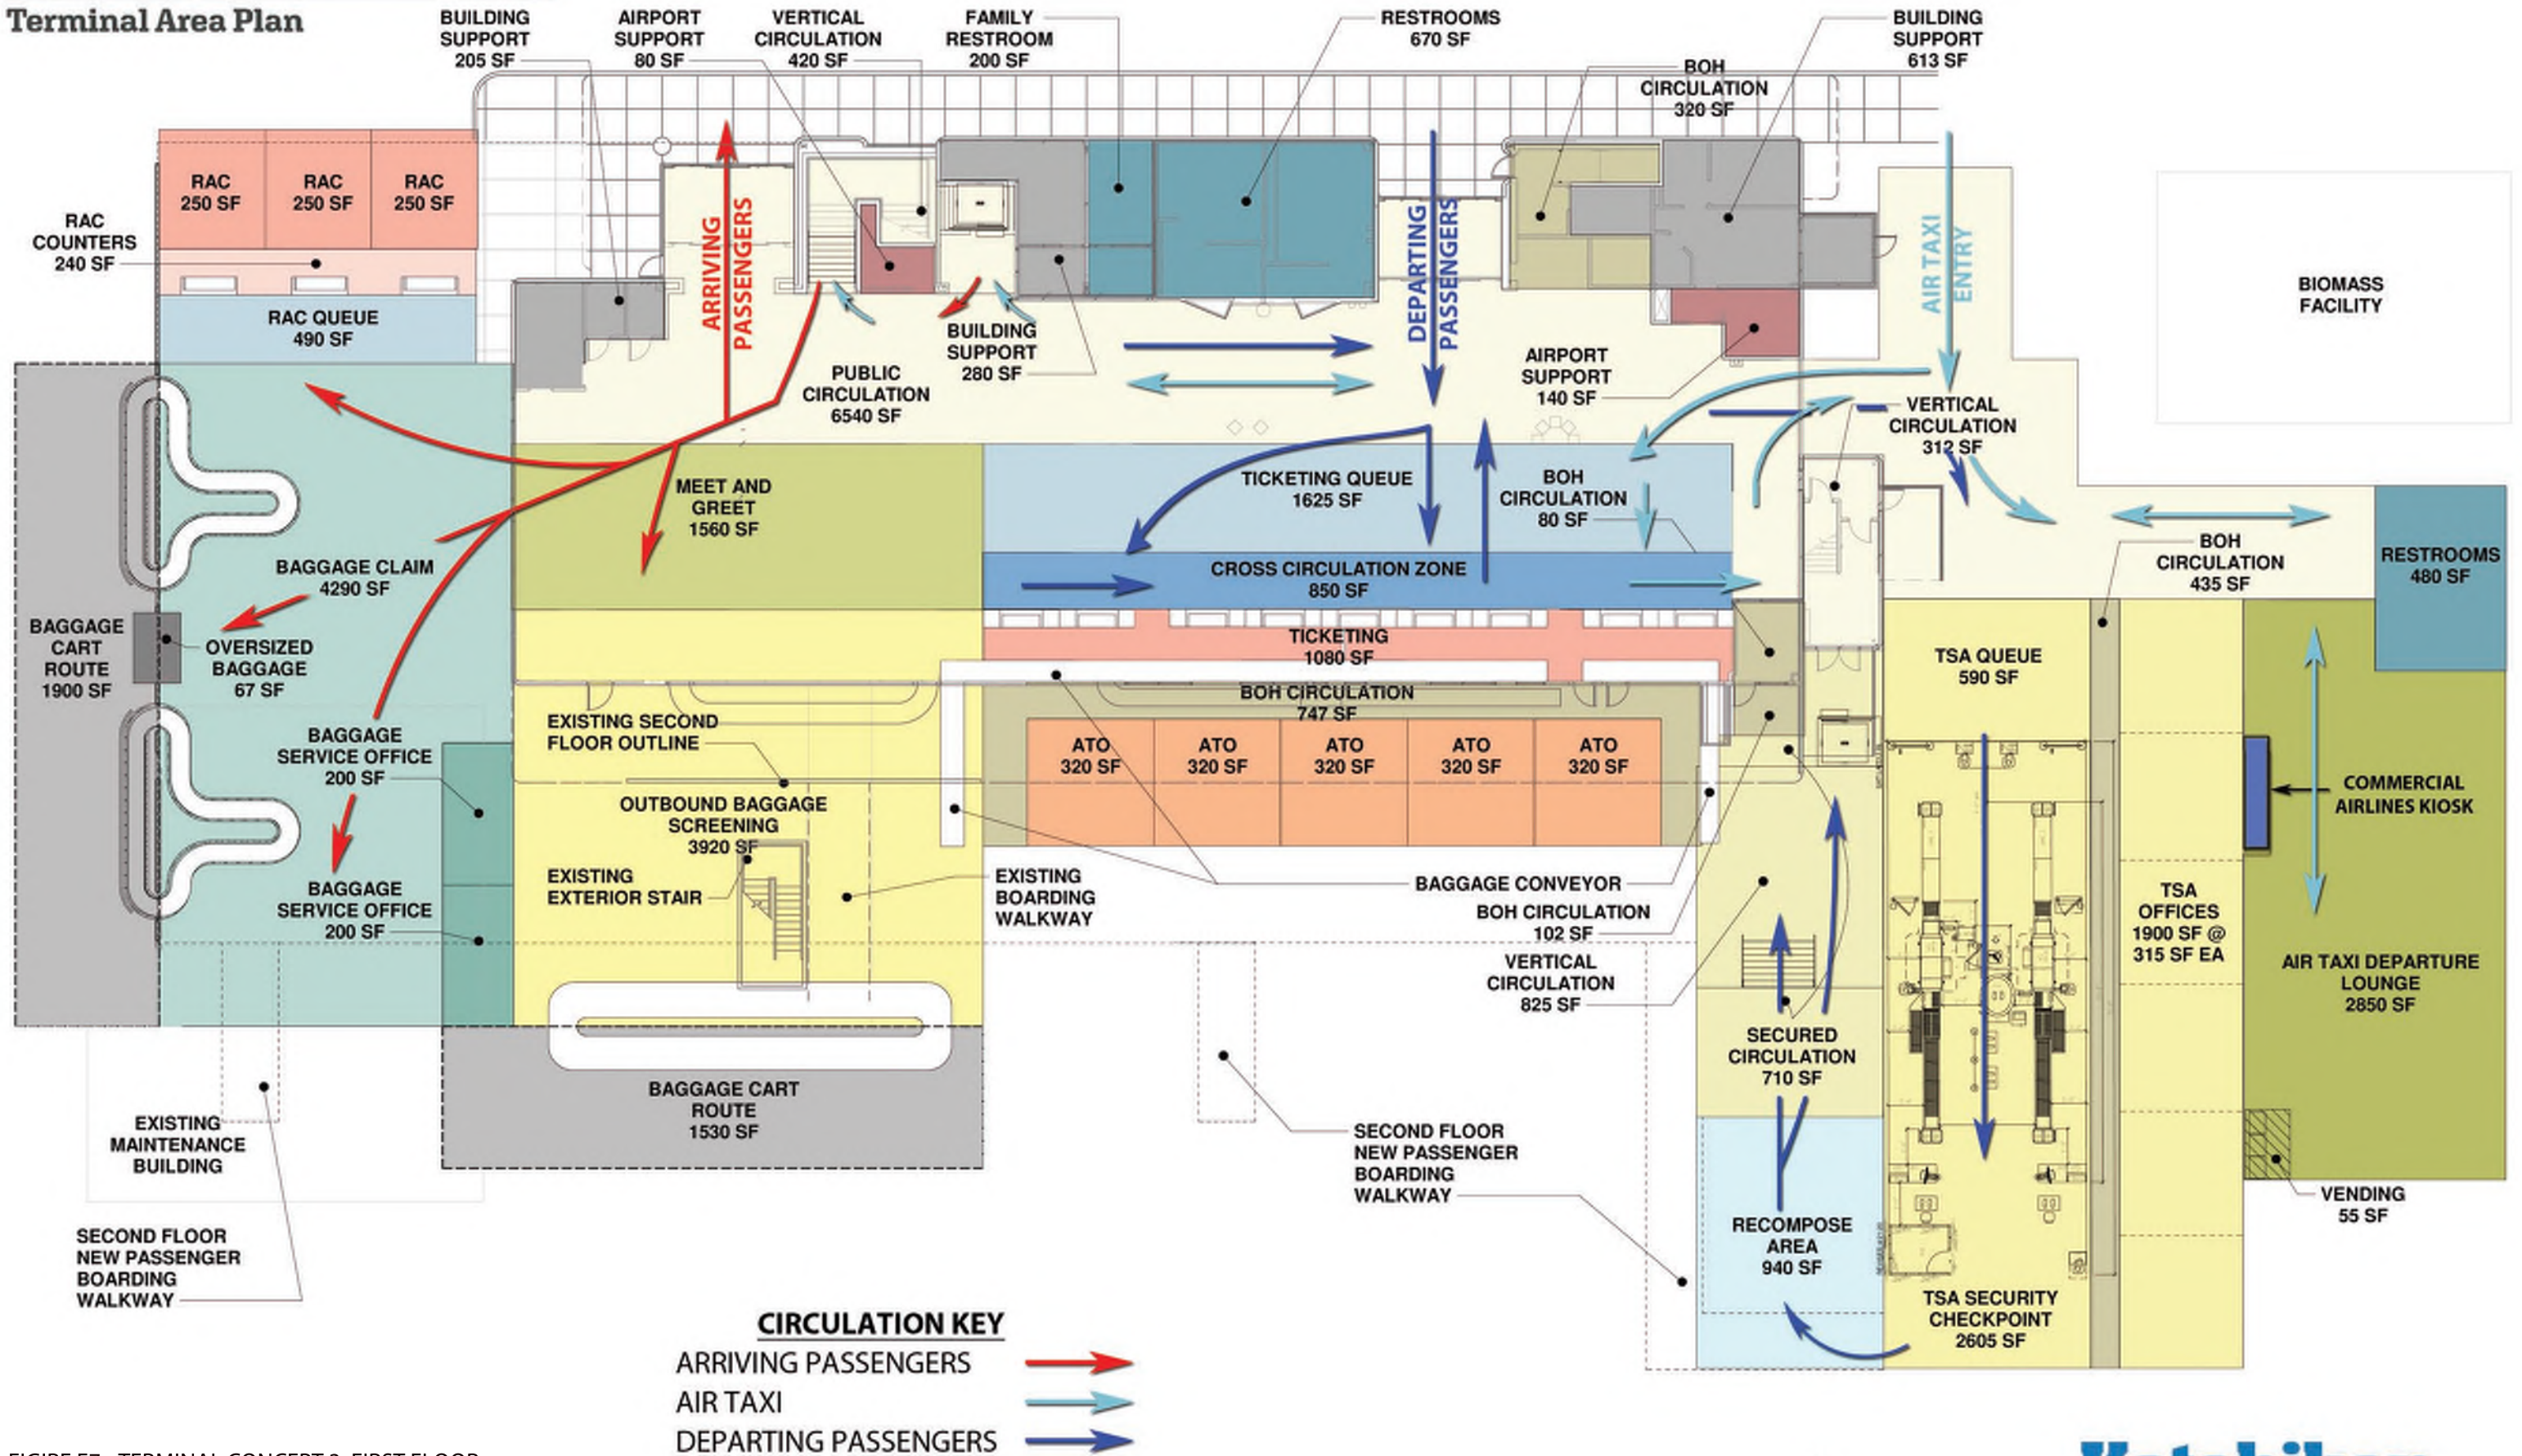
TERMINAL CONCEPT 3, FIRST FLOOR
